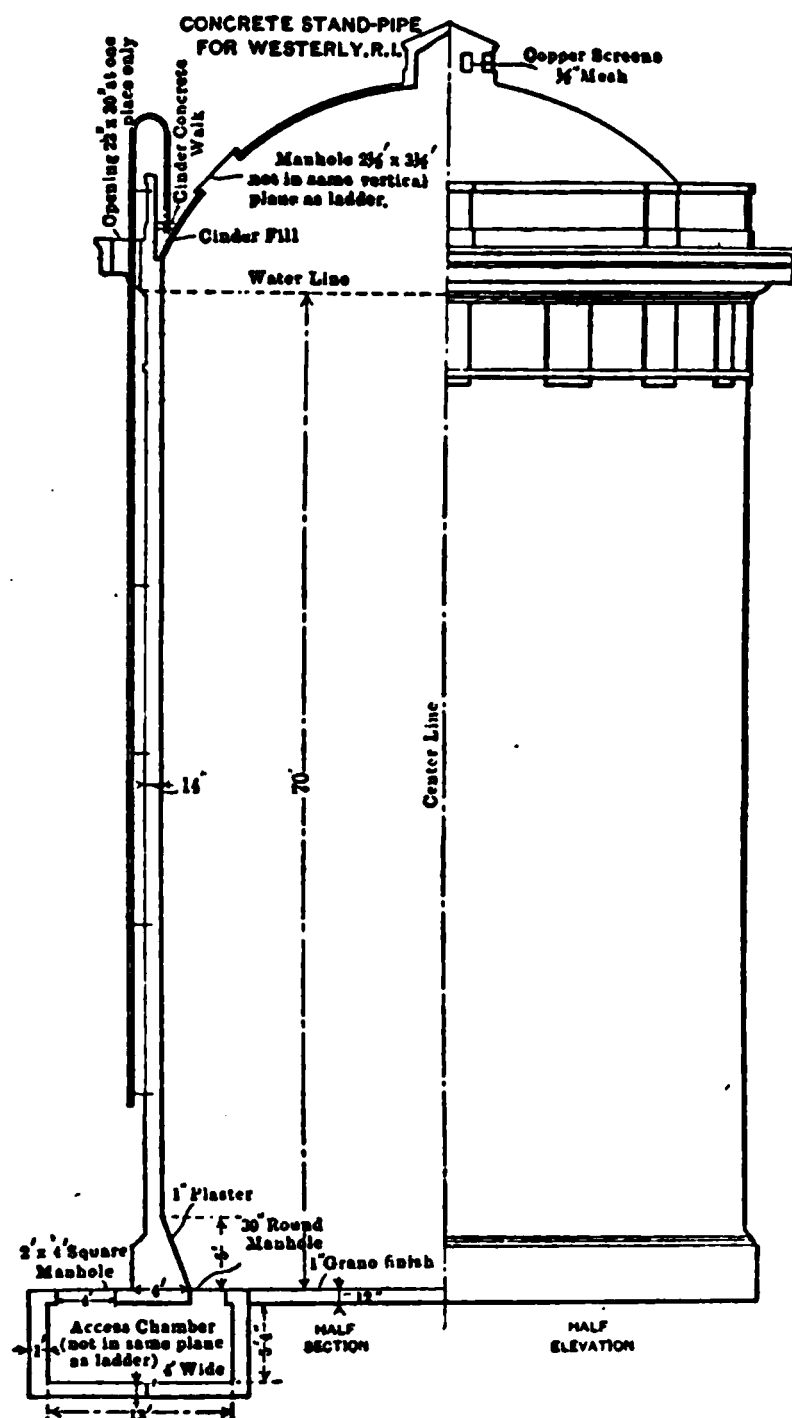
Elevation and section of reinforced concrete stand-pipe, Westerly, R. I.
